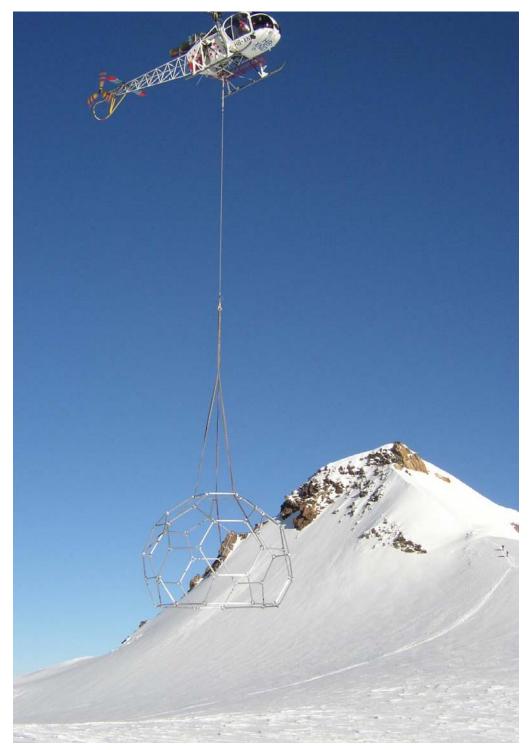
Dome of drill shelter approaching to land at drill site by helicopter
